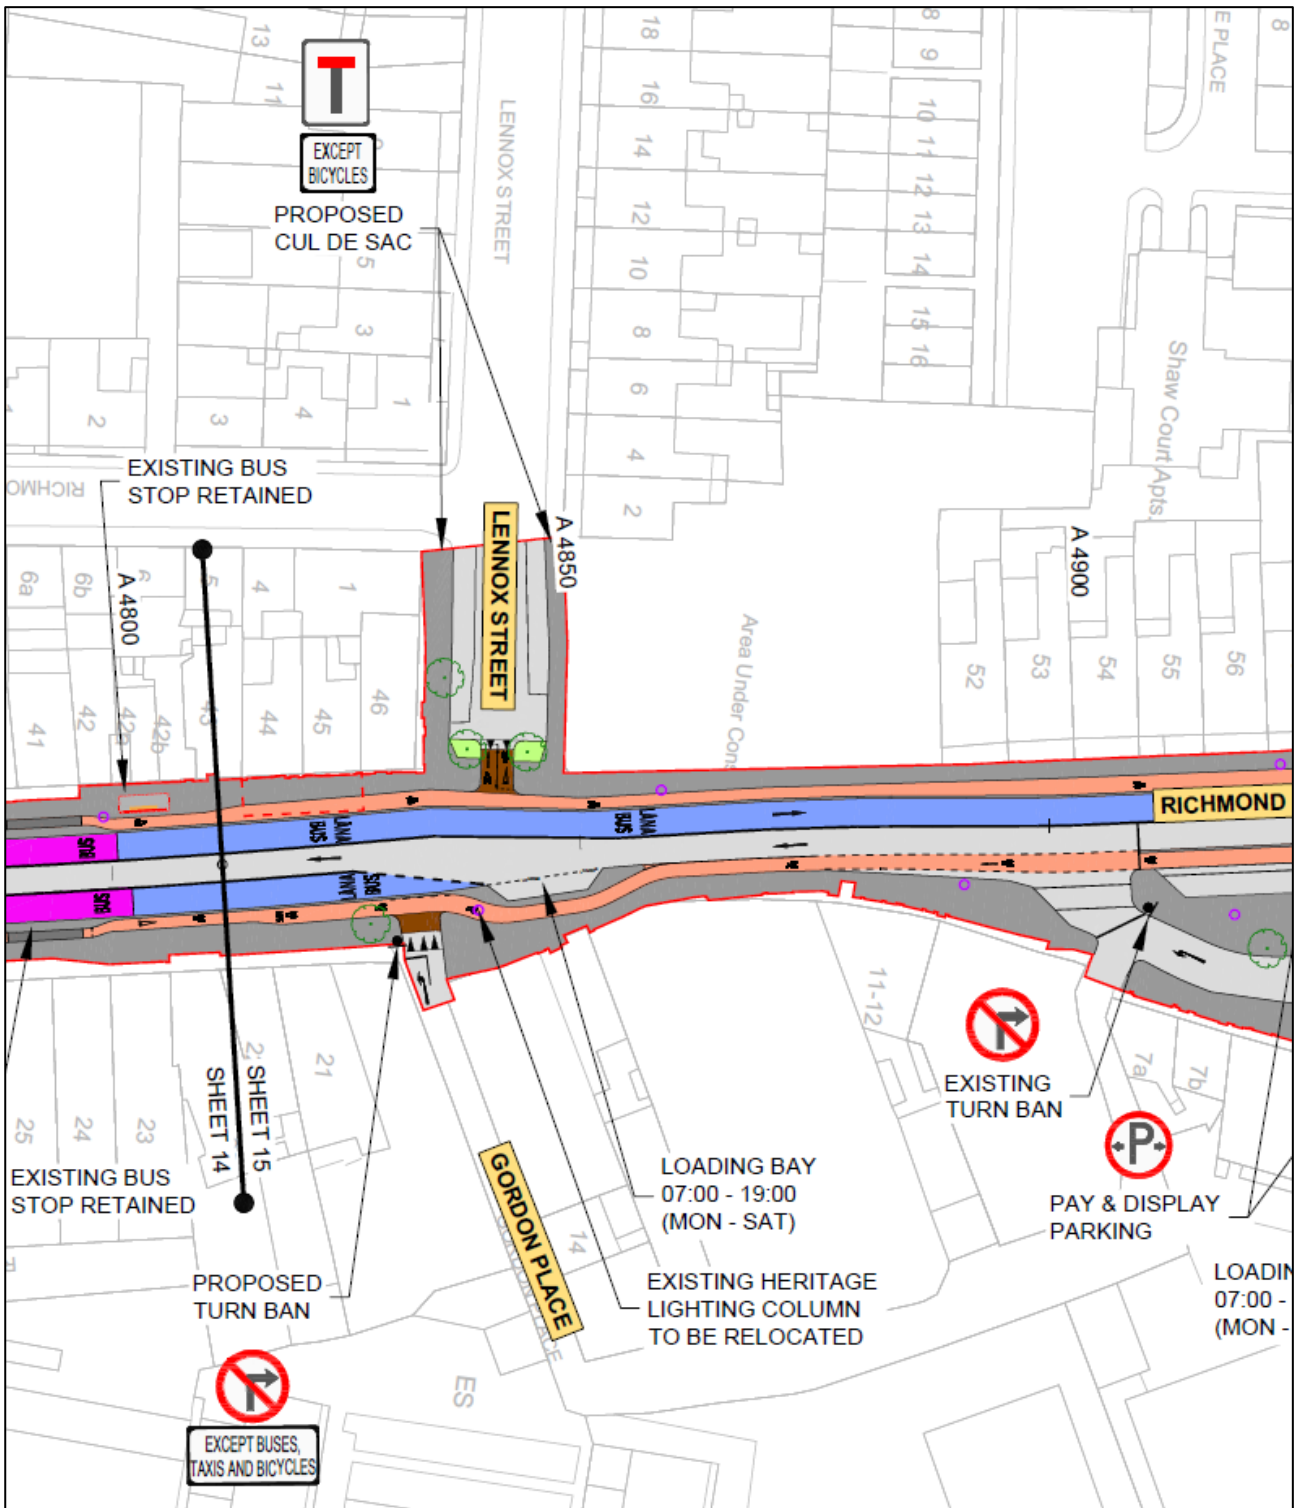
Extract from General Arrangement Drawings (Sheet 15)
